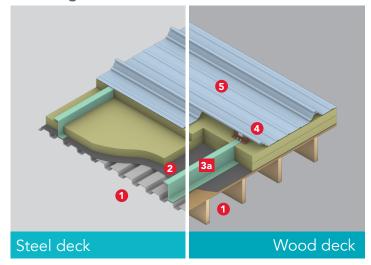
Structural metal roof panel system over insulation fitted between metal Z-framing, over steel or wood decking
